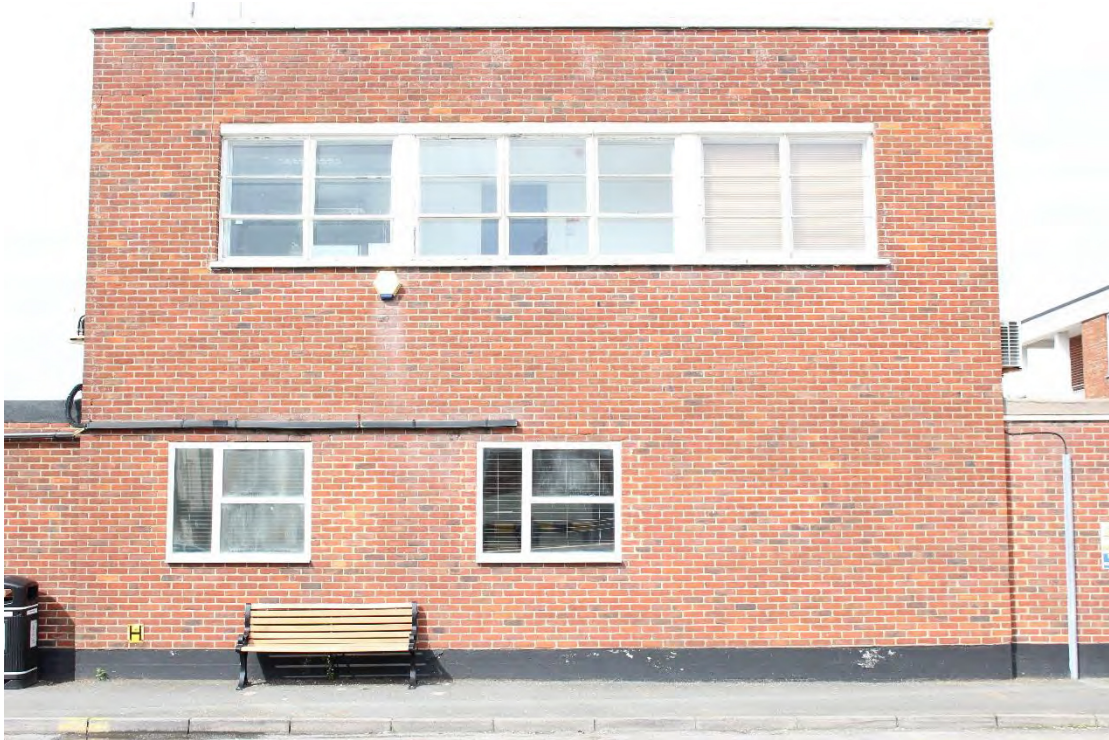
Eastern elevation of Building 7 of Trinity House Depot.
